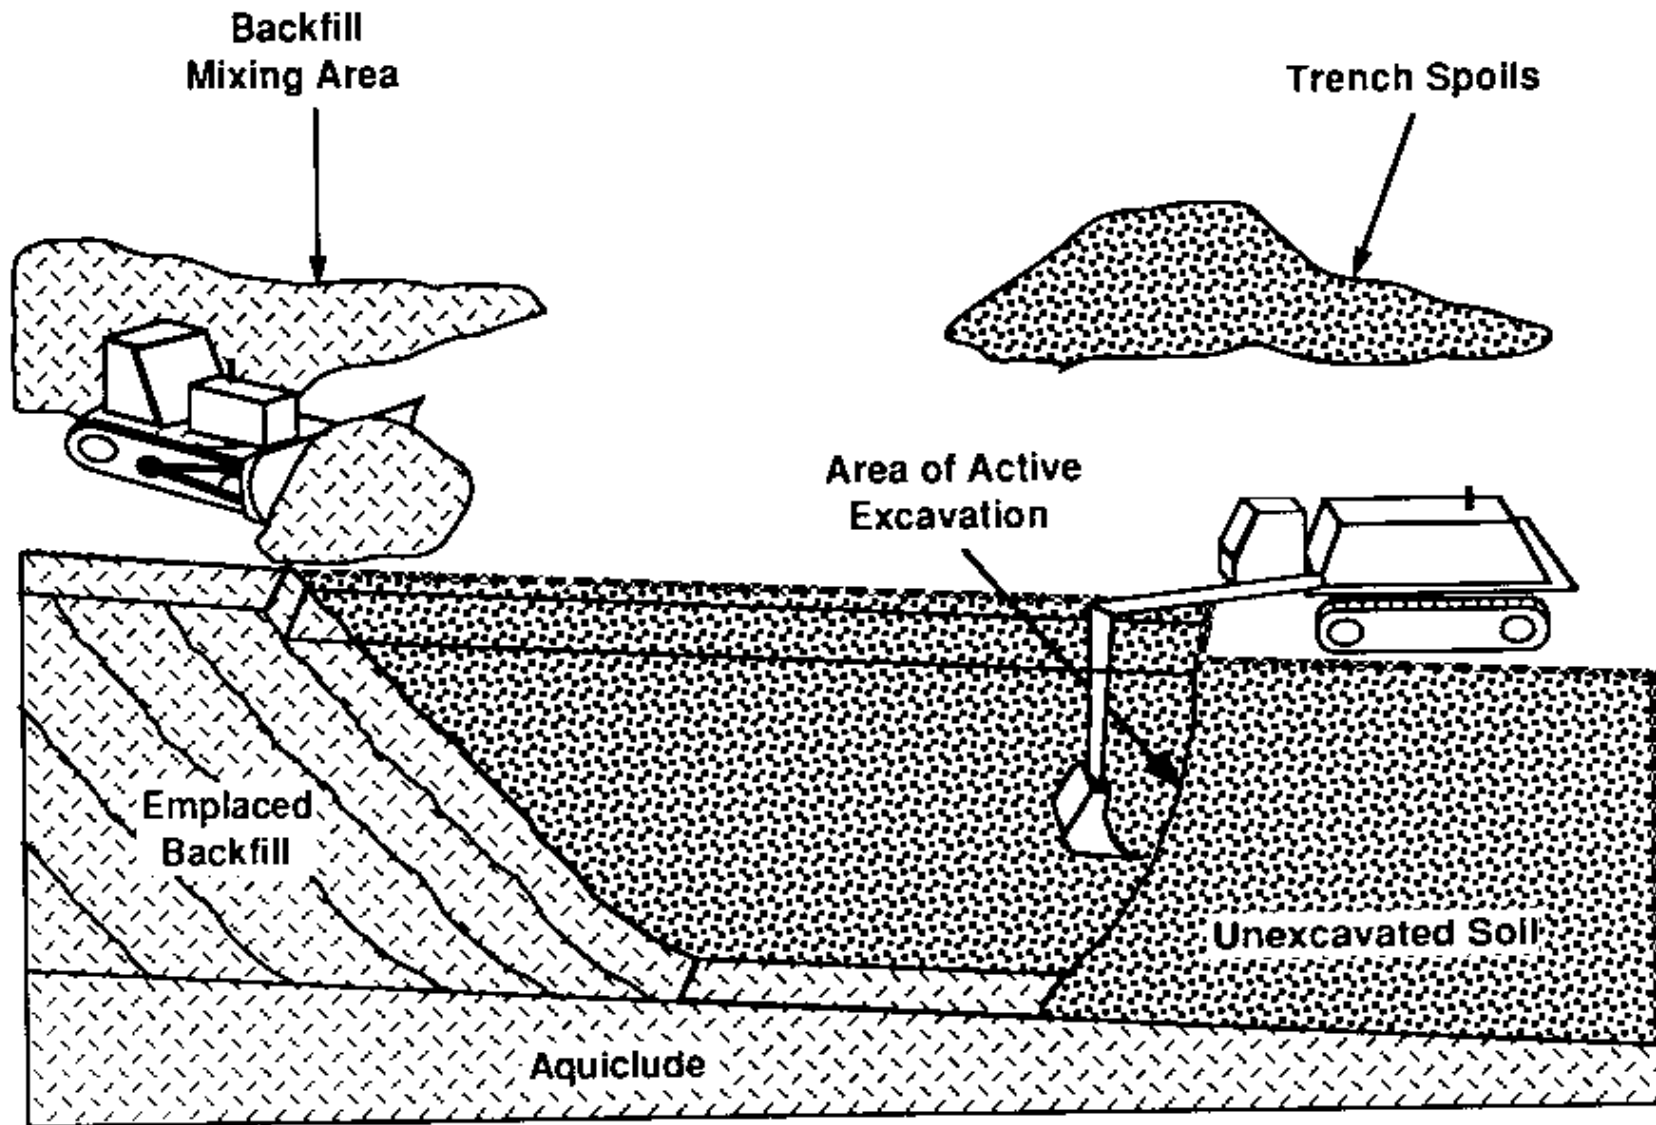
Excavation of trench and placement of soil-bentonite backfill.
